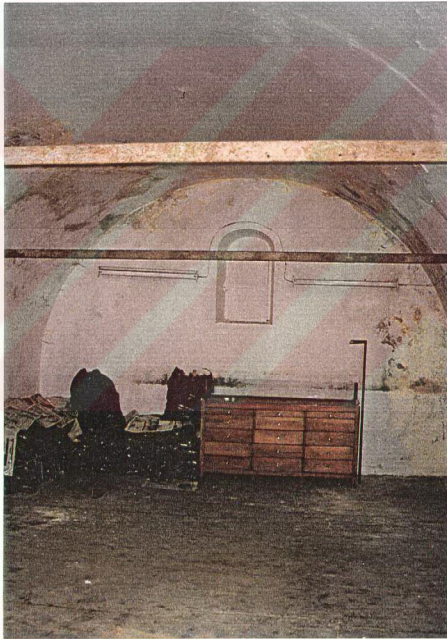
Vault and Tie bar of Space 13 (First Floor)
